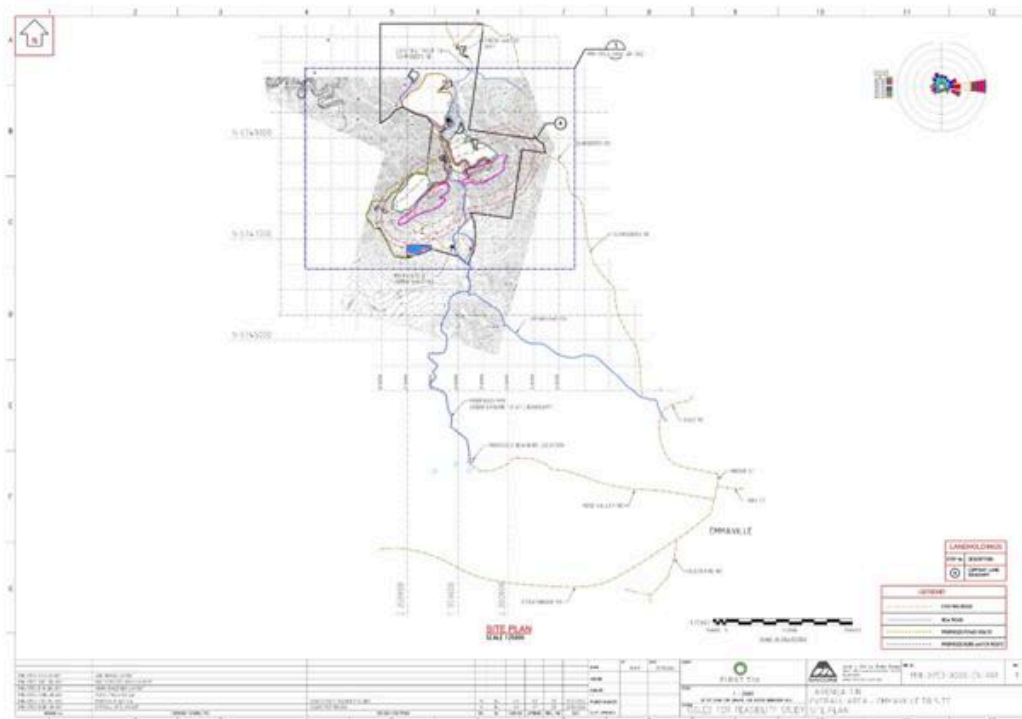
General Site Layout and Access Roads - Taronga Tin Project
